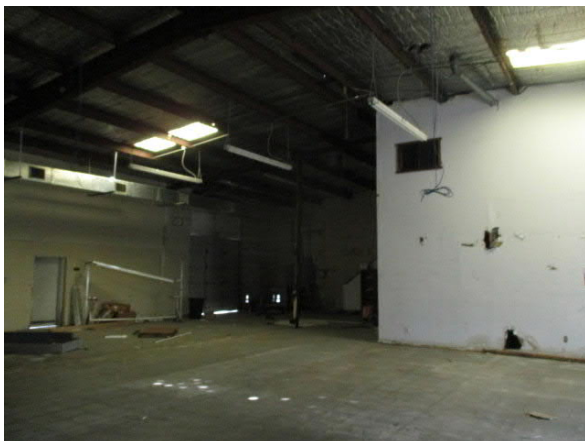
General view of the sump observed within the on-site 920 Justin Lane building
